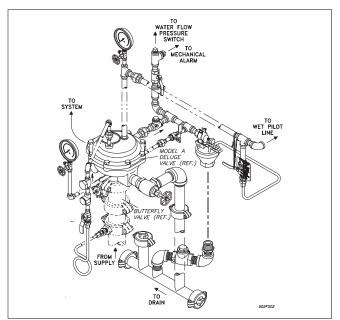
Model A Deluge Valve with Wet Pilot Trim and Optional Drain Manifold Trim
